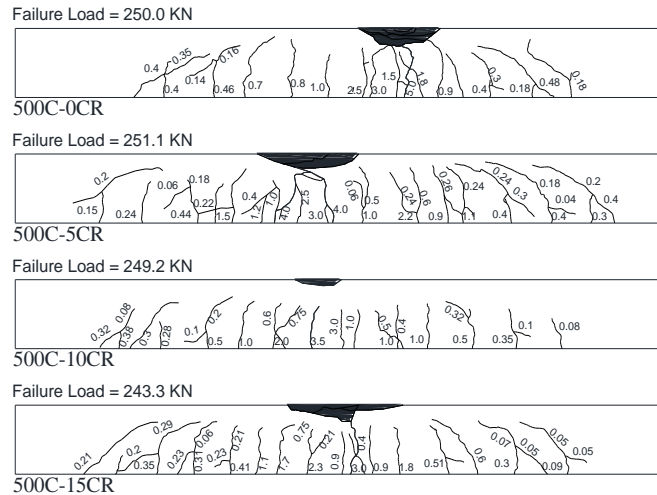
Crack patterns of tested beams at failure (crack width in mm)
